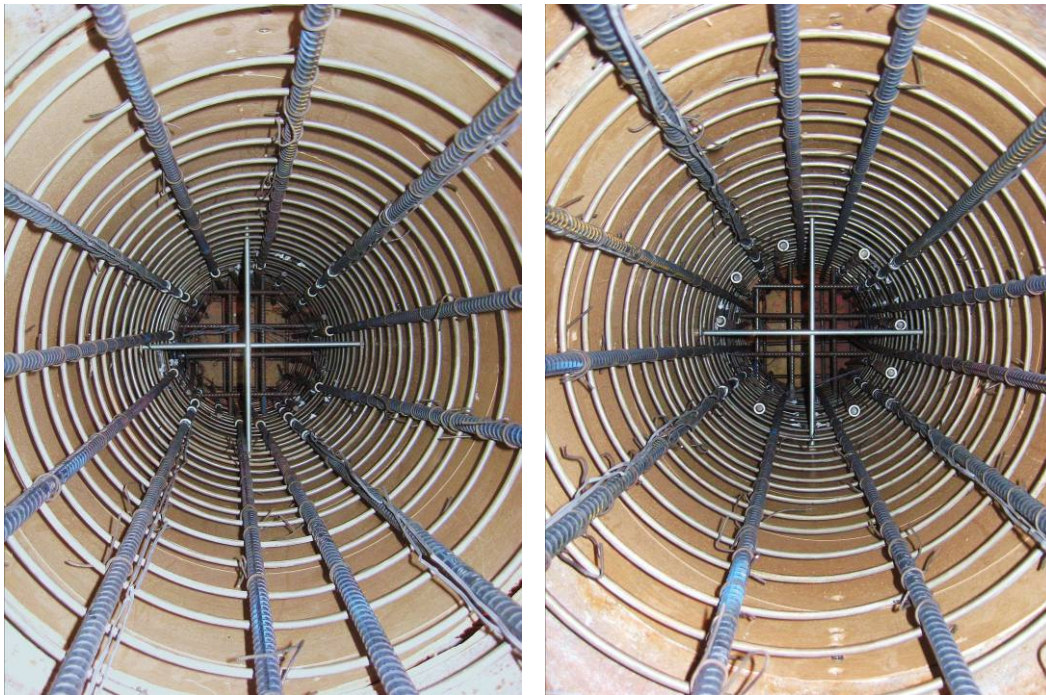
Interior view of column cages: (a) specimen S1; (b) specimen S2
